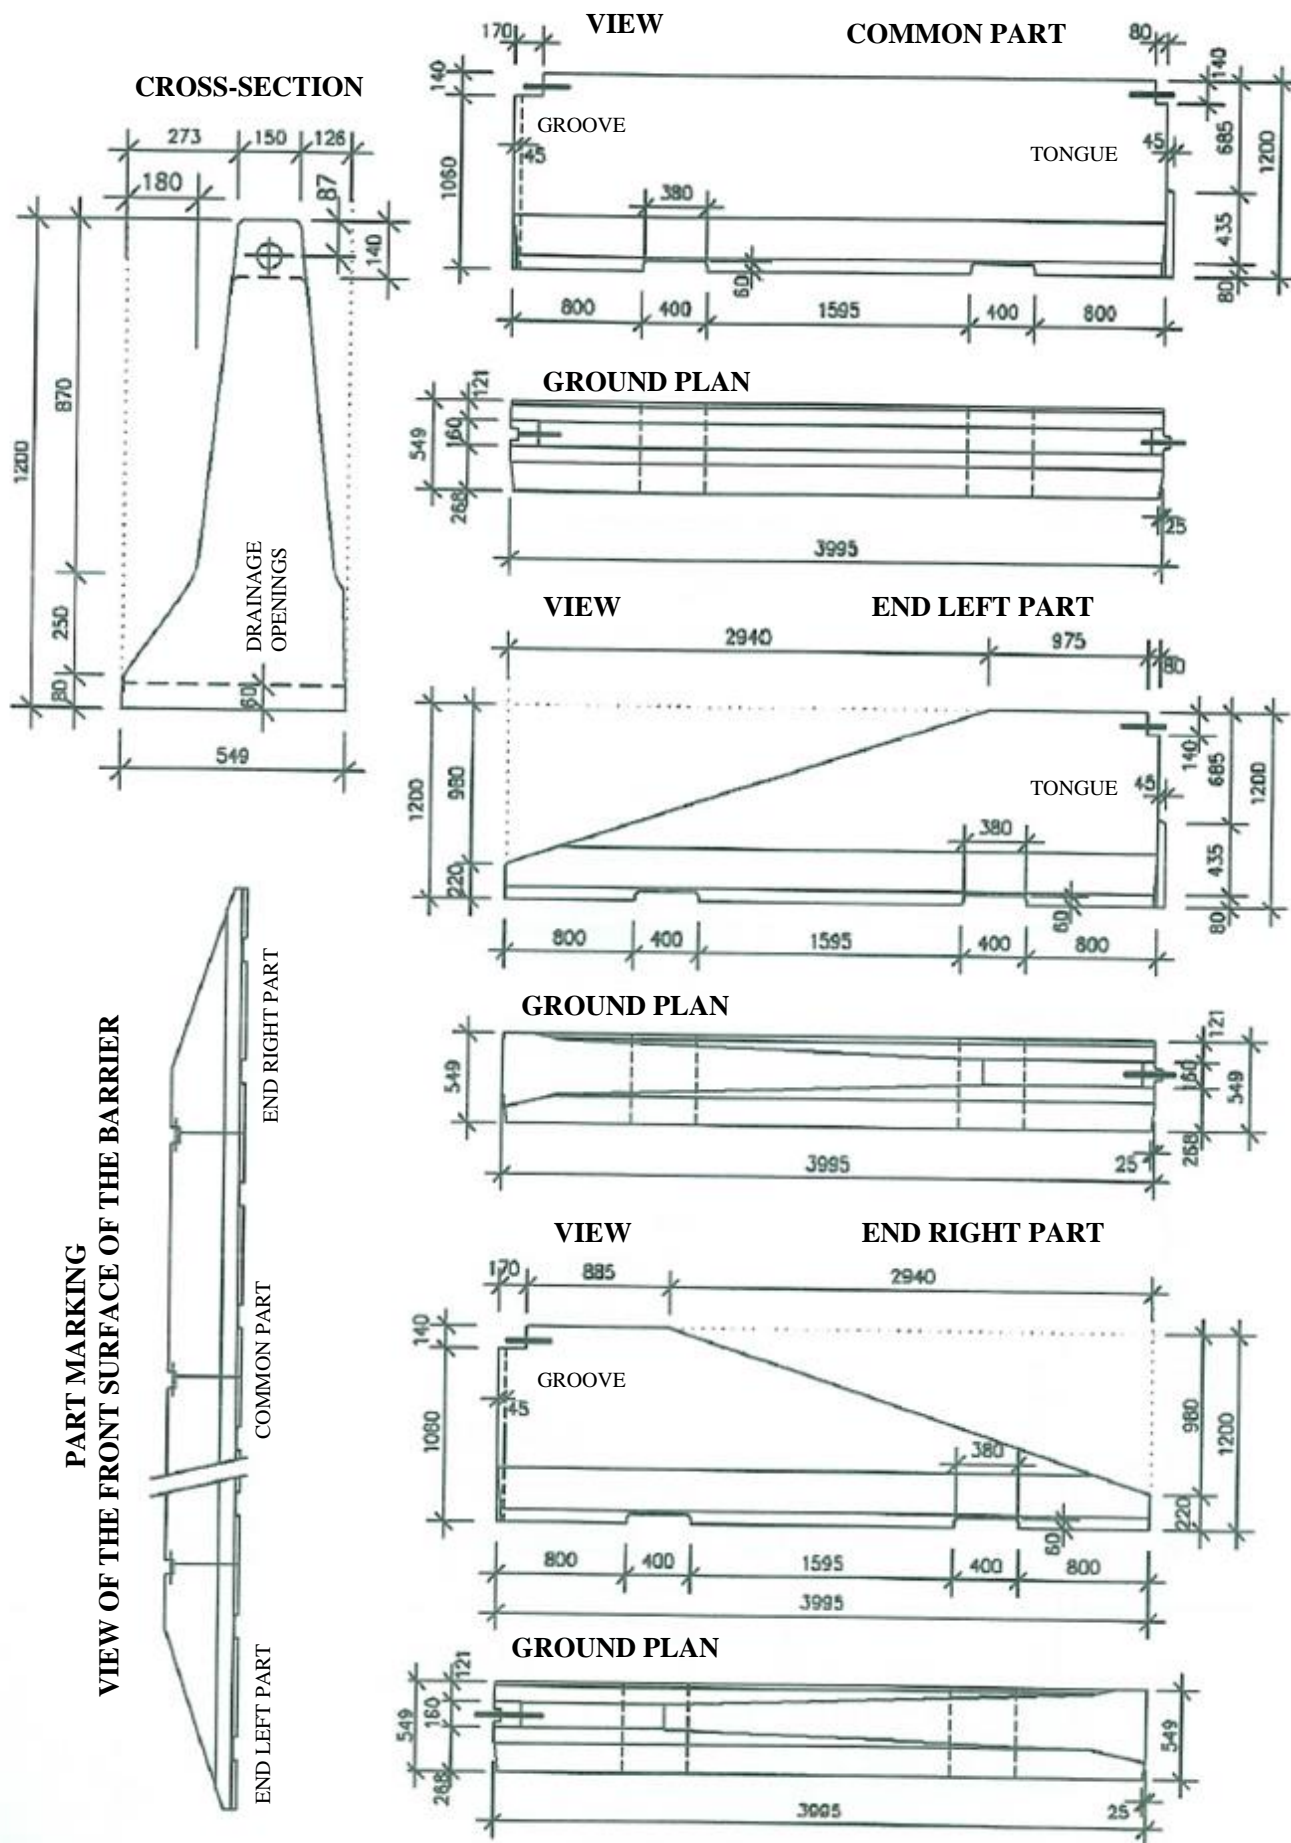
Single sided concrete barrier 1.2 m height – common and end part
